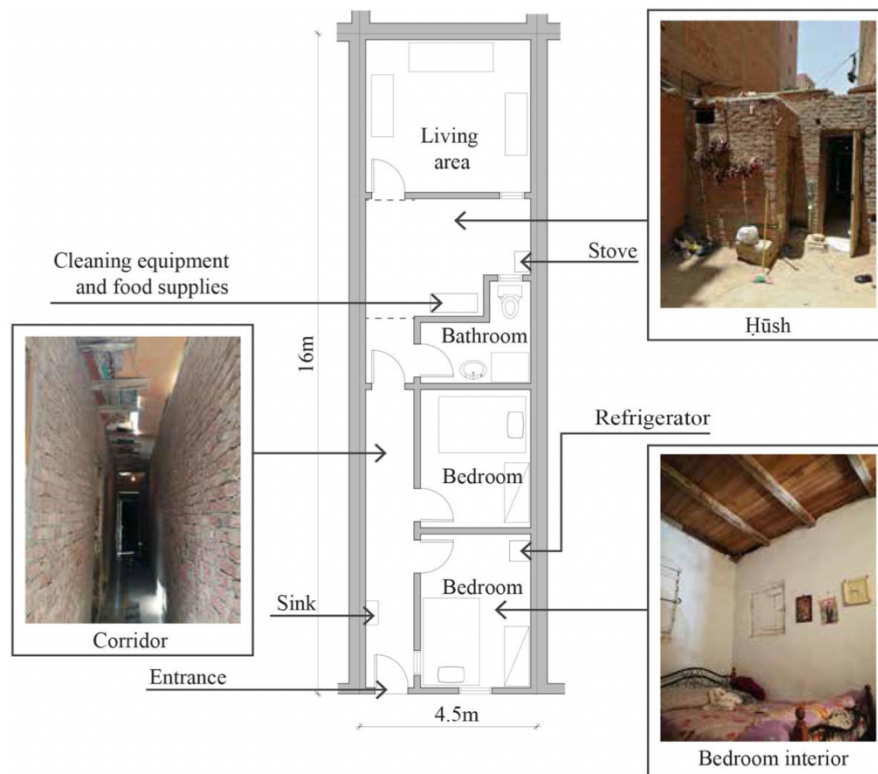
TYPICAL PLAN OF SUESSI HOUSE TYPOLOGY (BOULES ET AL., 2020)
